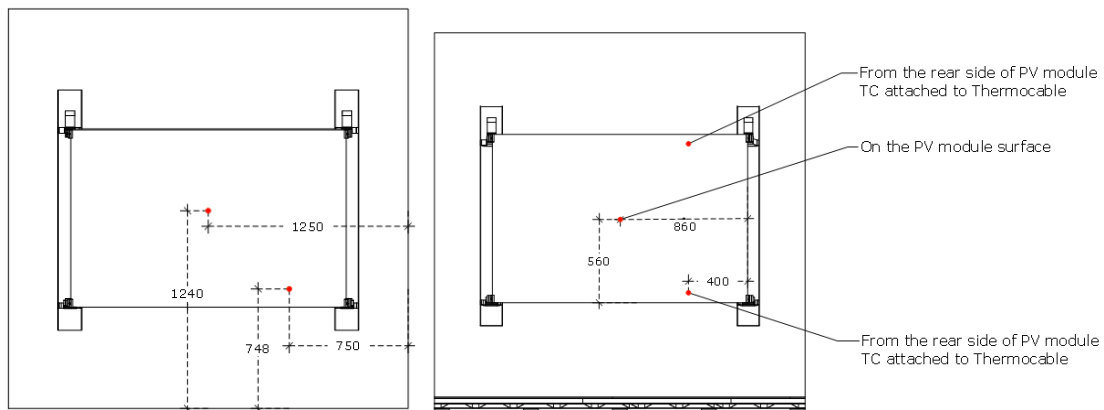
Locations of TCs on mid-scale flat-roof specimens (LHD-2): inside the roof (left) and on/under PV module (right)
